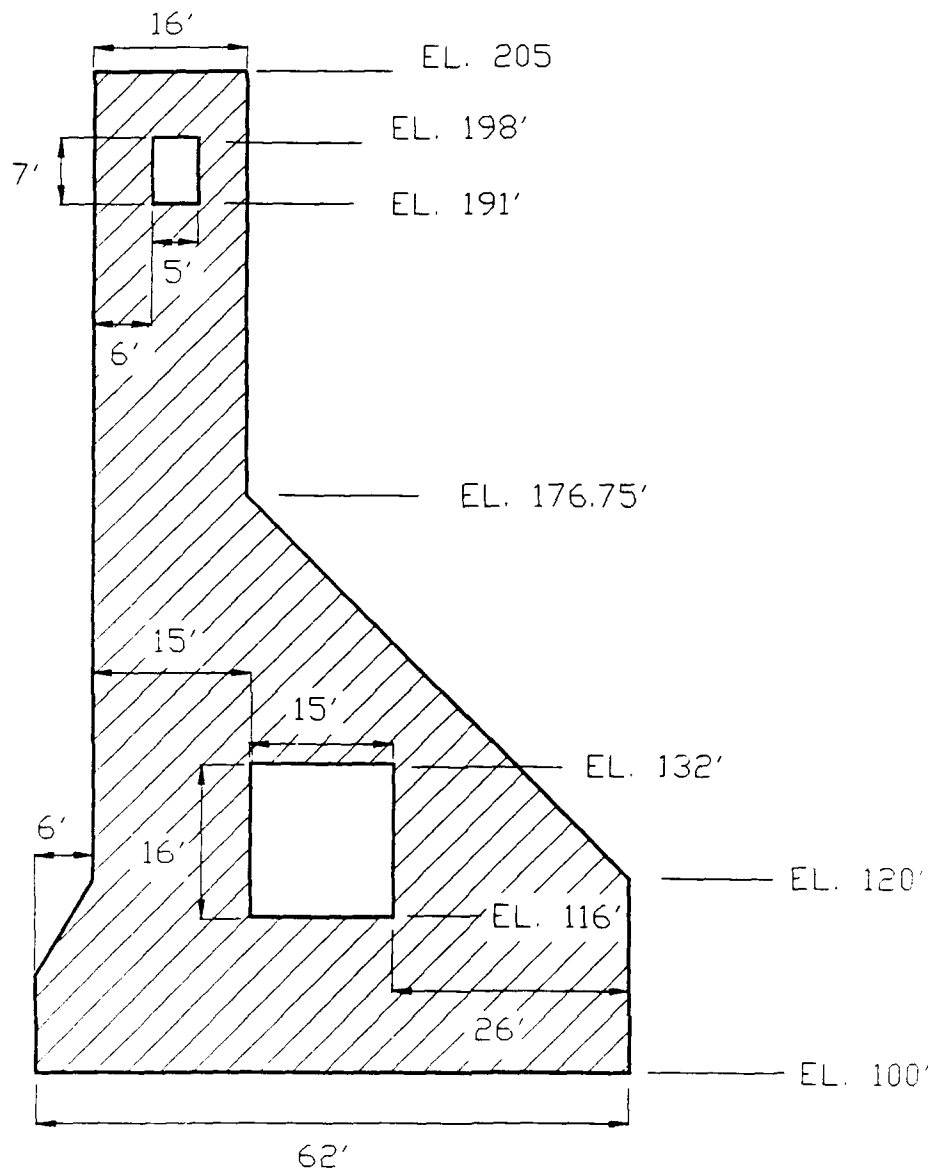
Basic elevations and dimensions for the model of north chamber wall monoliths at Snell Lock
